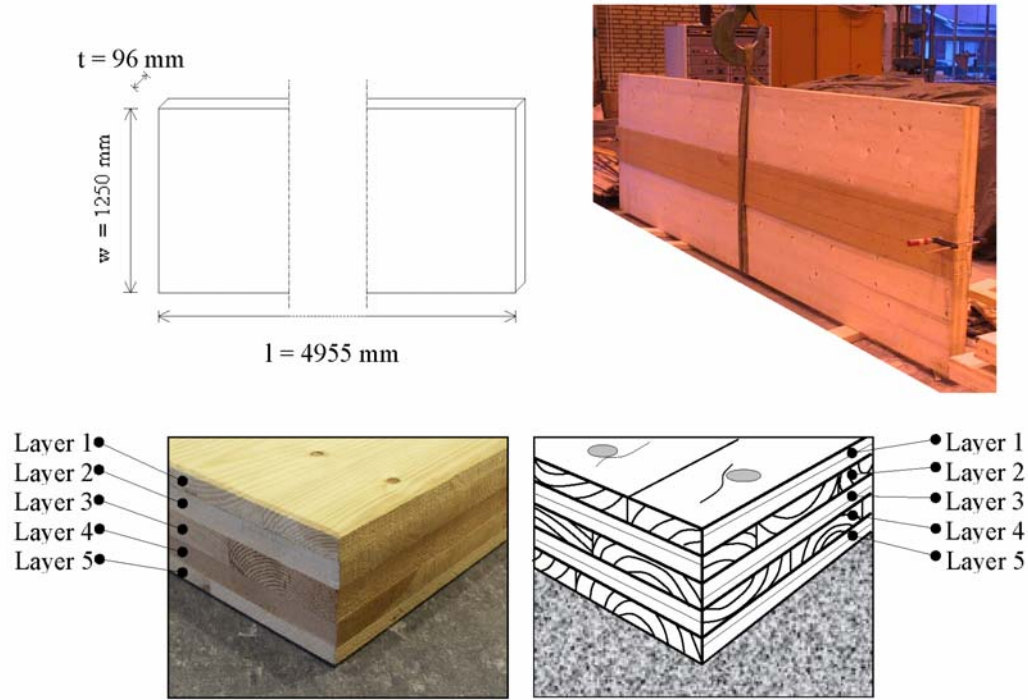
The five-layer cross-laminated timber-wall elements tested.
